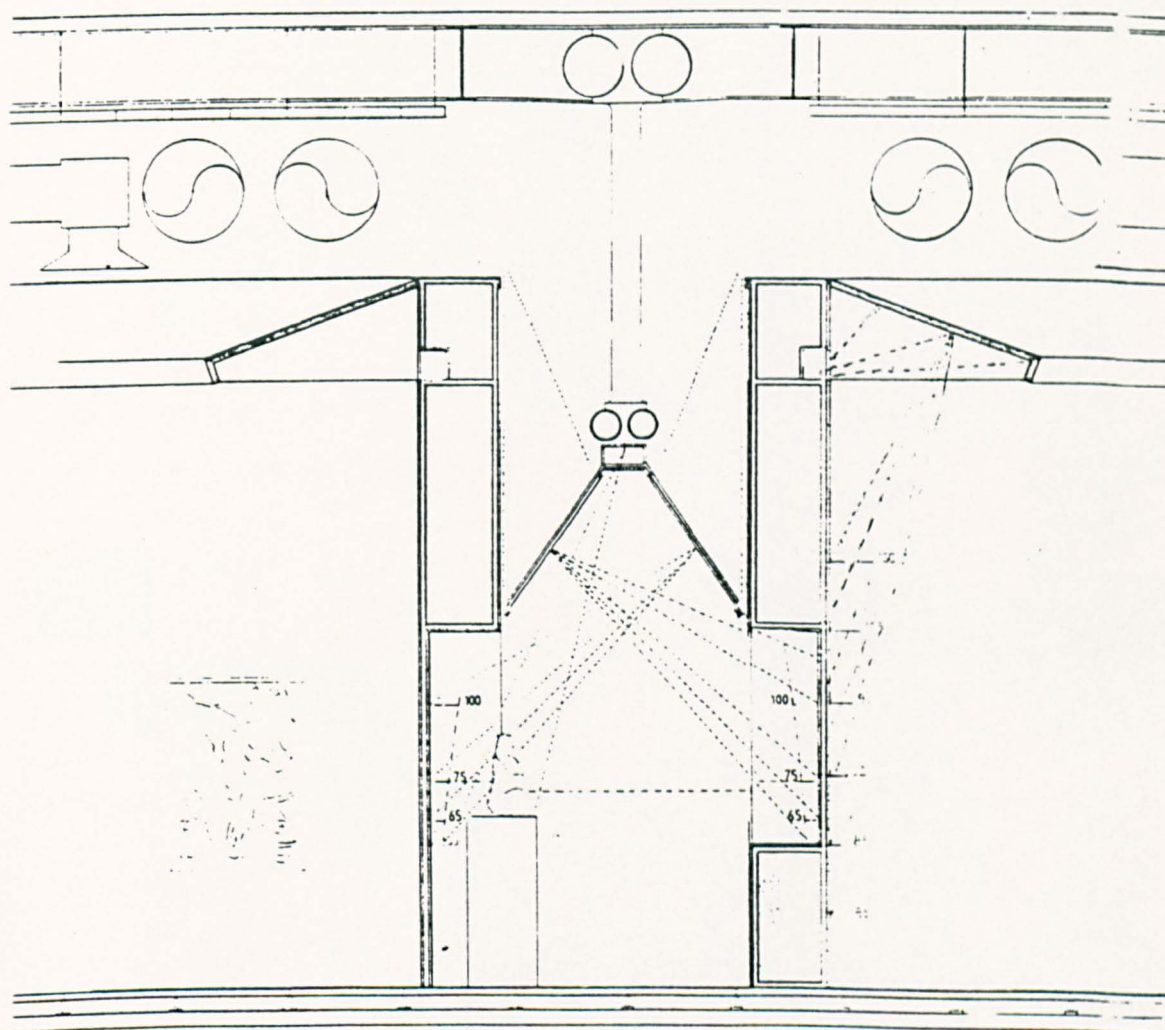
Gae Aulenti, reconstruction of the principal gallery space on the fourth floor of Pompidou Centre. Spatial order and a degree of environmental specificity are introduced into the previously flexible, adaptable, 'soft' interior. The original free plan arrangement has been replaced by a highly structured sequence of rooms which takes the major structural bay of the buildings as its principal determinant. The lighting is incorporated in the walls of the new enclosures, rather than on grids in the ceiling structure as before, and by reflecting off ceiling panels, simulates the lighting quality found in many traditional top-lit galleries.
